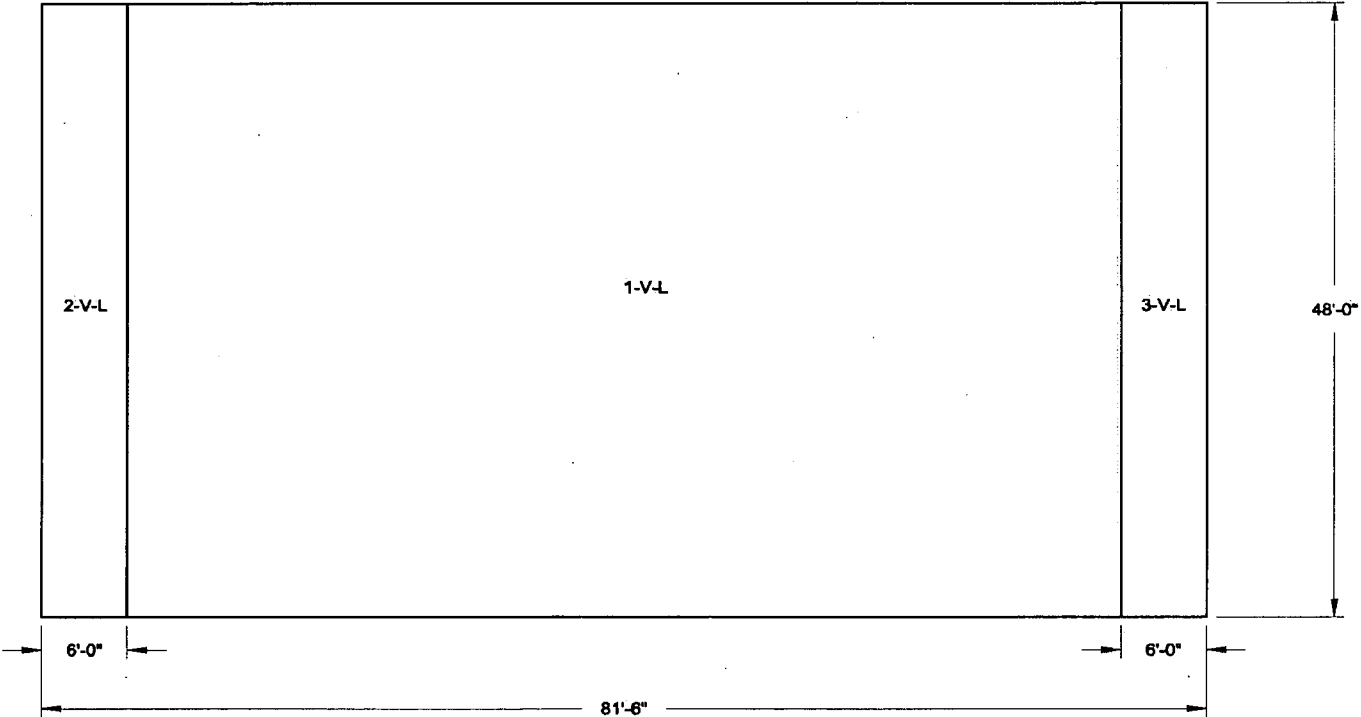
H.8-145: SLAB 1 LOOKING DOWN
